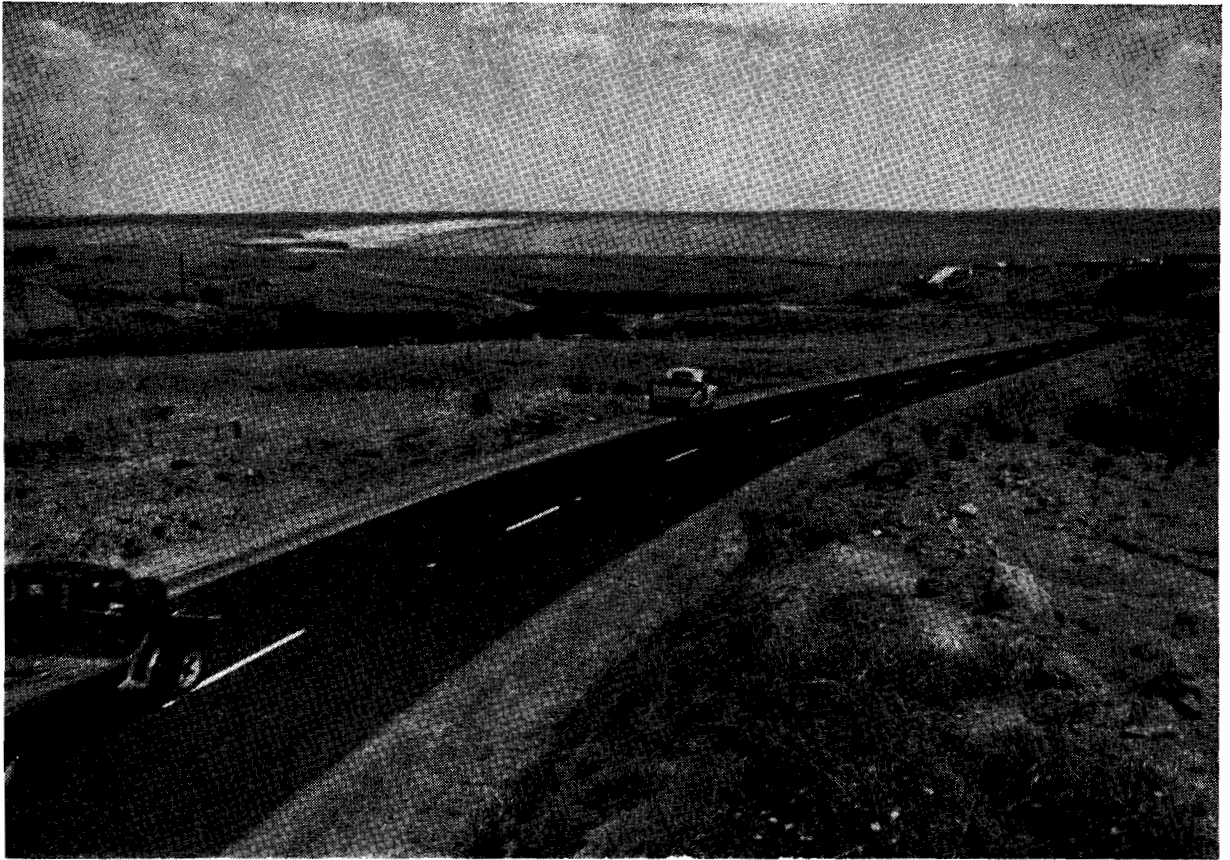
Bass Highway. A reconstructed section south-east of Anderson.
